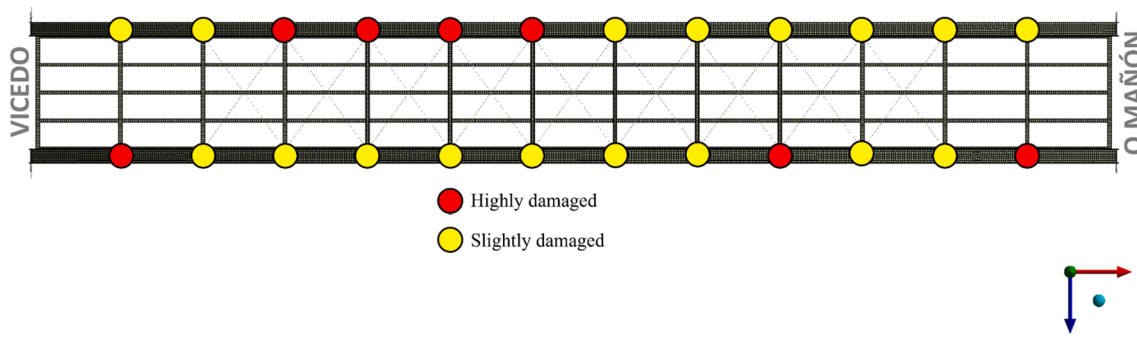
Scheme of the damaged condition state of the steel connections.
